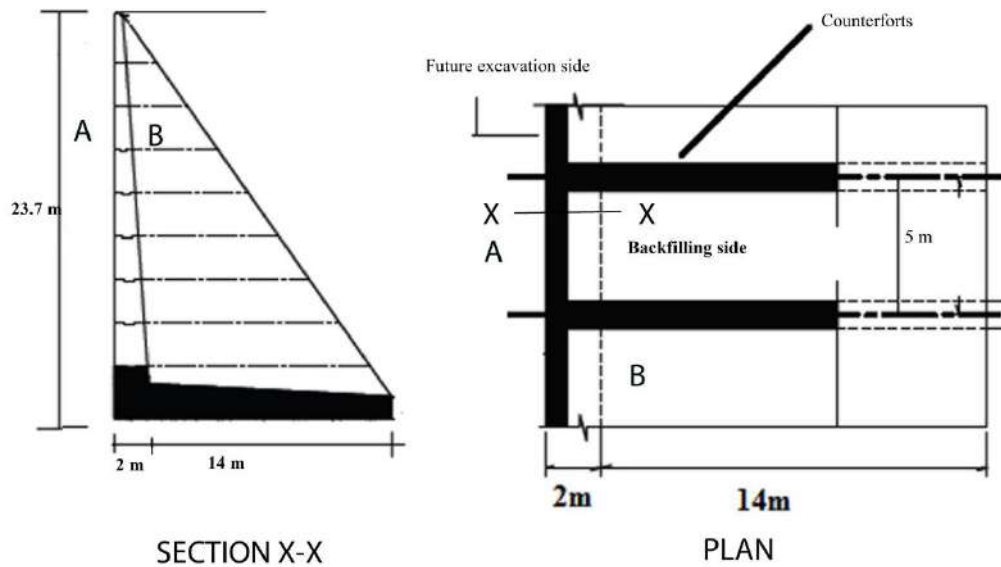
Schematic diagram of retaining wall for future excavation
